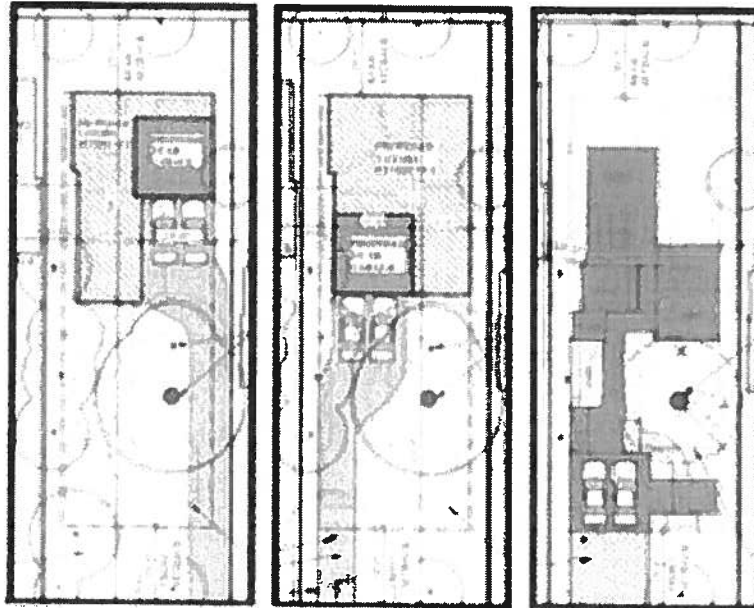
Alternative “Area Plan Conceptual Sketches” submitted by LeMieux. Elevation sketches have not been made available. Alternative designs that consider raising the lower bound of the tree’s canopy have also not been made available.
